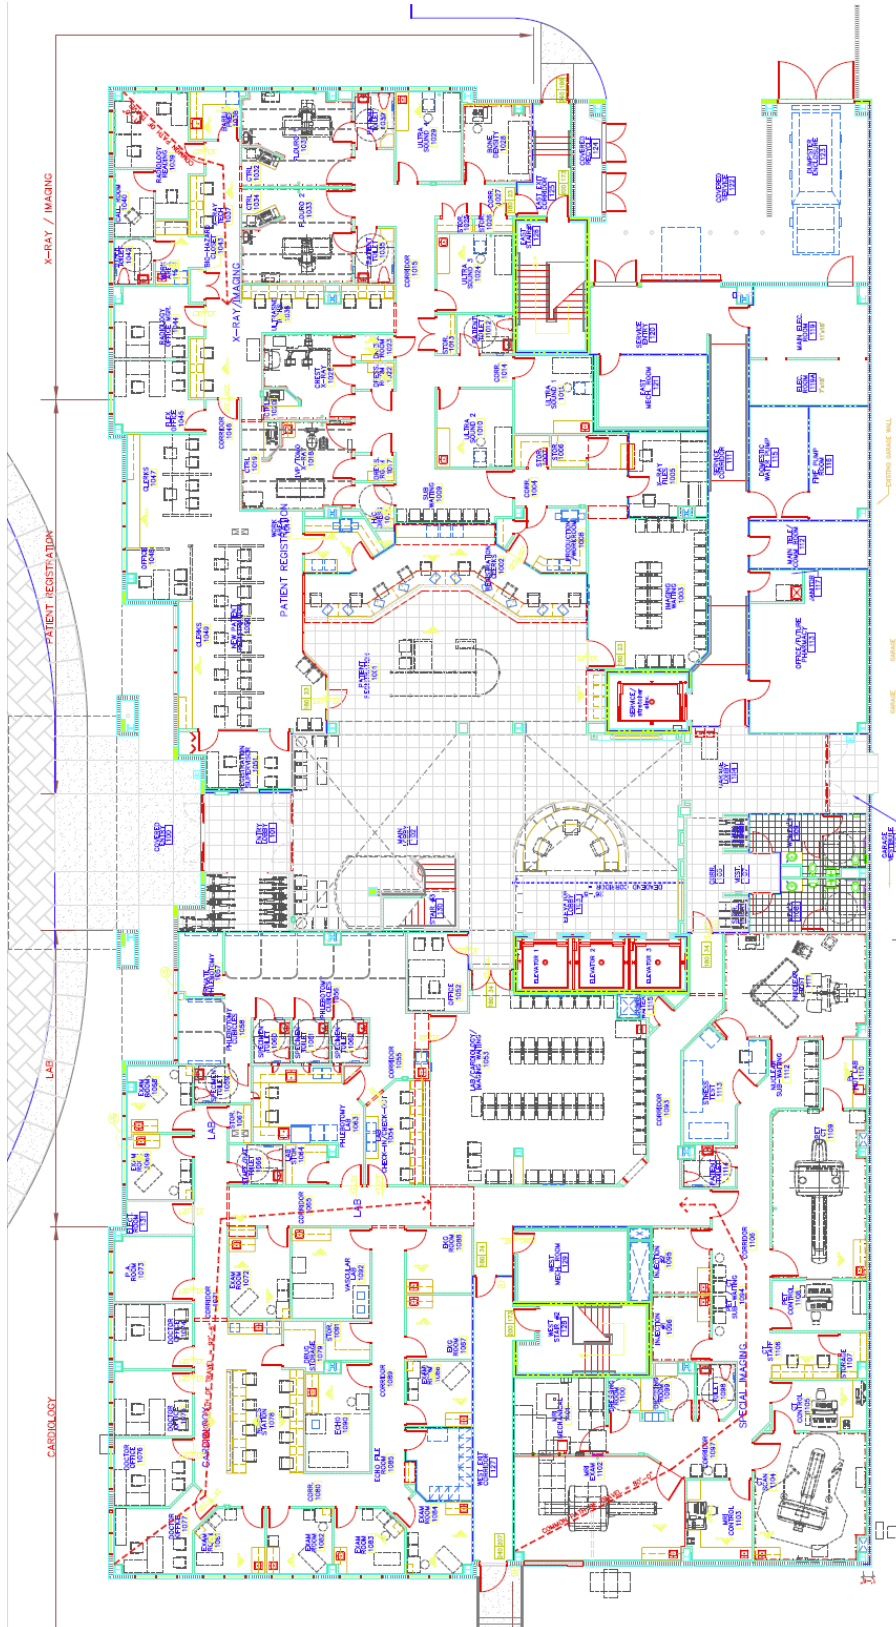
, First Floor Plan w/ Tenant Build-Out
